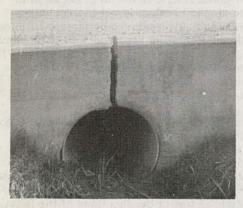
Cracked Headwall Caused by Frost Heaving of Shallow Culvert Pipe.
